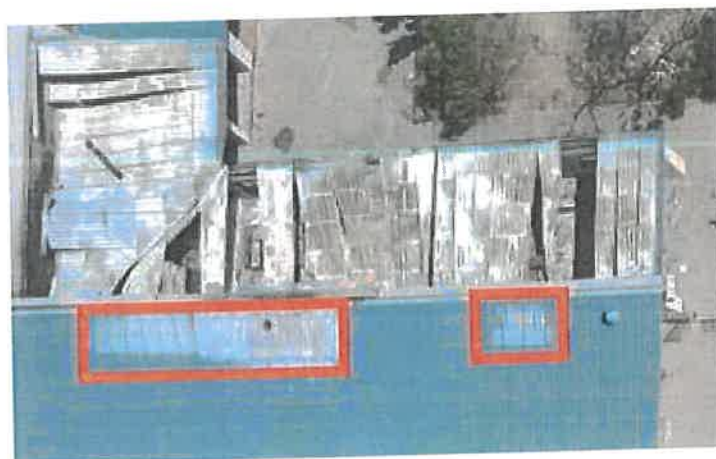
Visible roof sheeting damage above high level passage area, that is marked in red blocks
